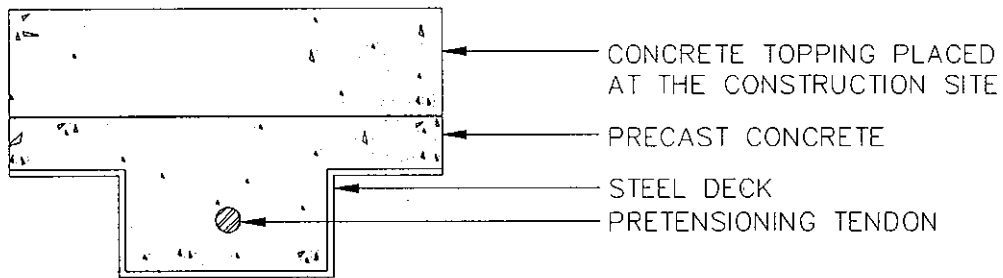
Cross section of the composite prestressed deck constructed with Generic steel deck
